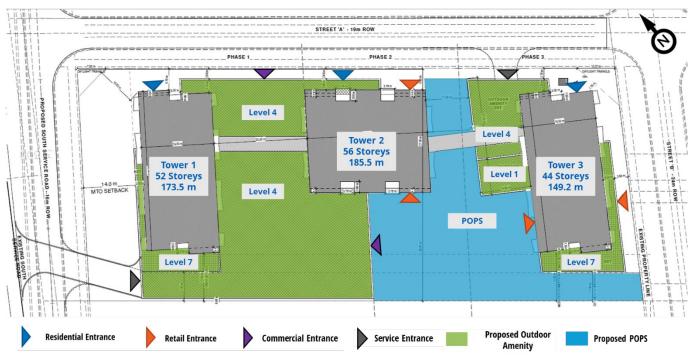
Original Site Plan (2023-07-08), Courtesy of Distrikt
